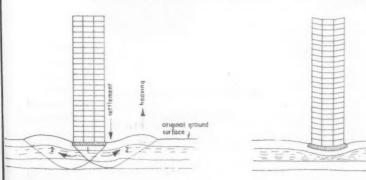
(far left). Foundation failure by shear failure of the underlying strata. Fig. 2 (left). Foundation failure by excessive differential settlement arising from consolidation of a compressible stratum.
